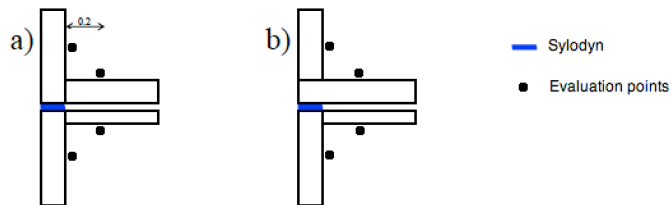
Different Syldyn positions: (a) floor and ceiling installed between the walls and (b) floor installed upon walls. The evaluation points are dots in the figure (6 evaluation points along each line are considered).
